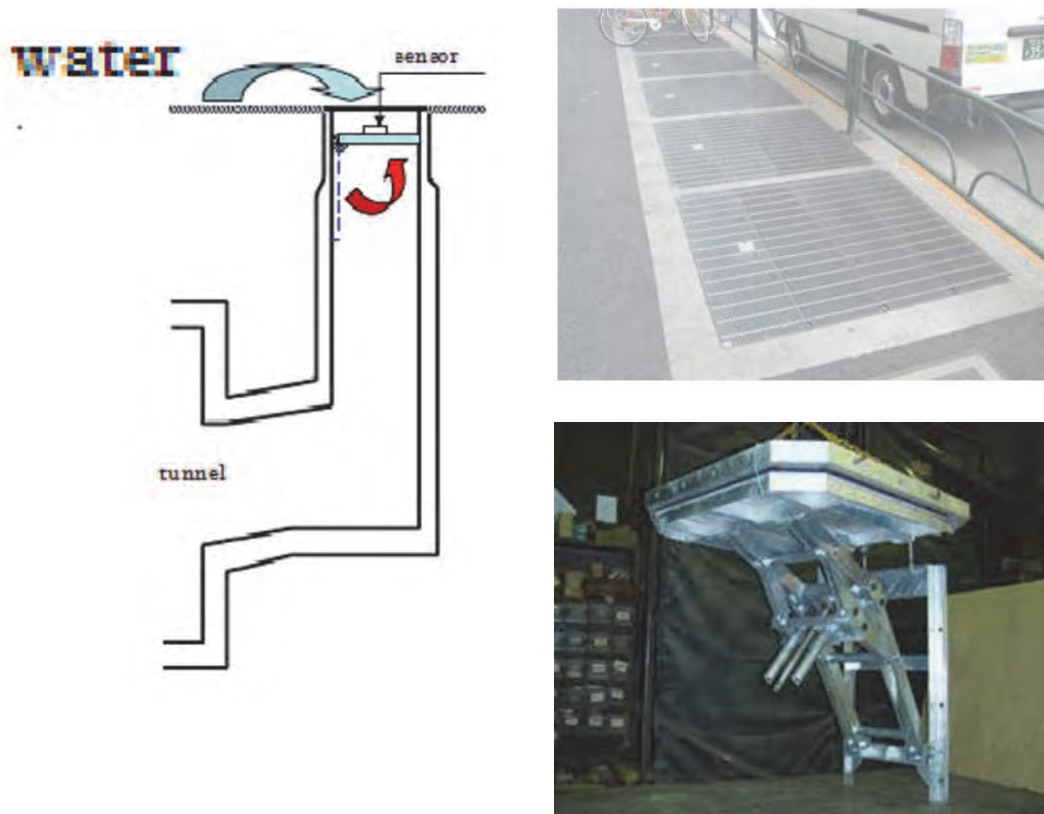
New Type Entrance of Subway Station in Tokyo
